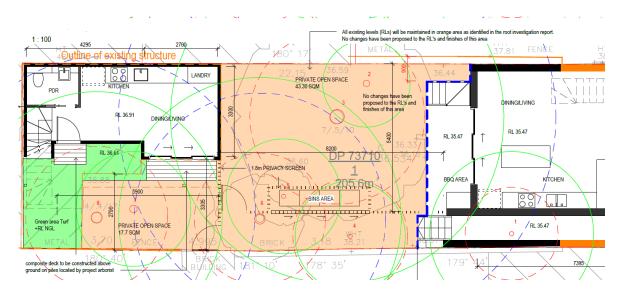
Proposed ground floor level plan. No changes to RLs proposed in area shaded in orange.
